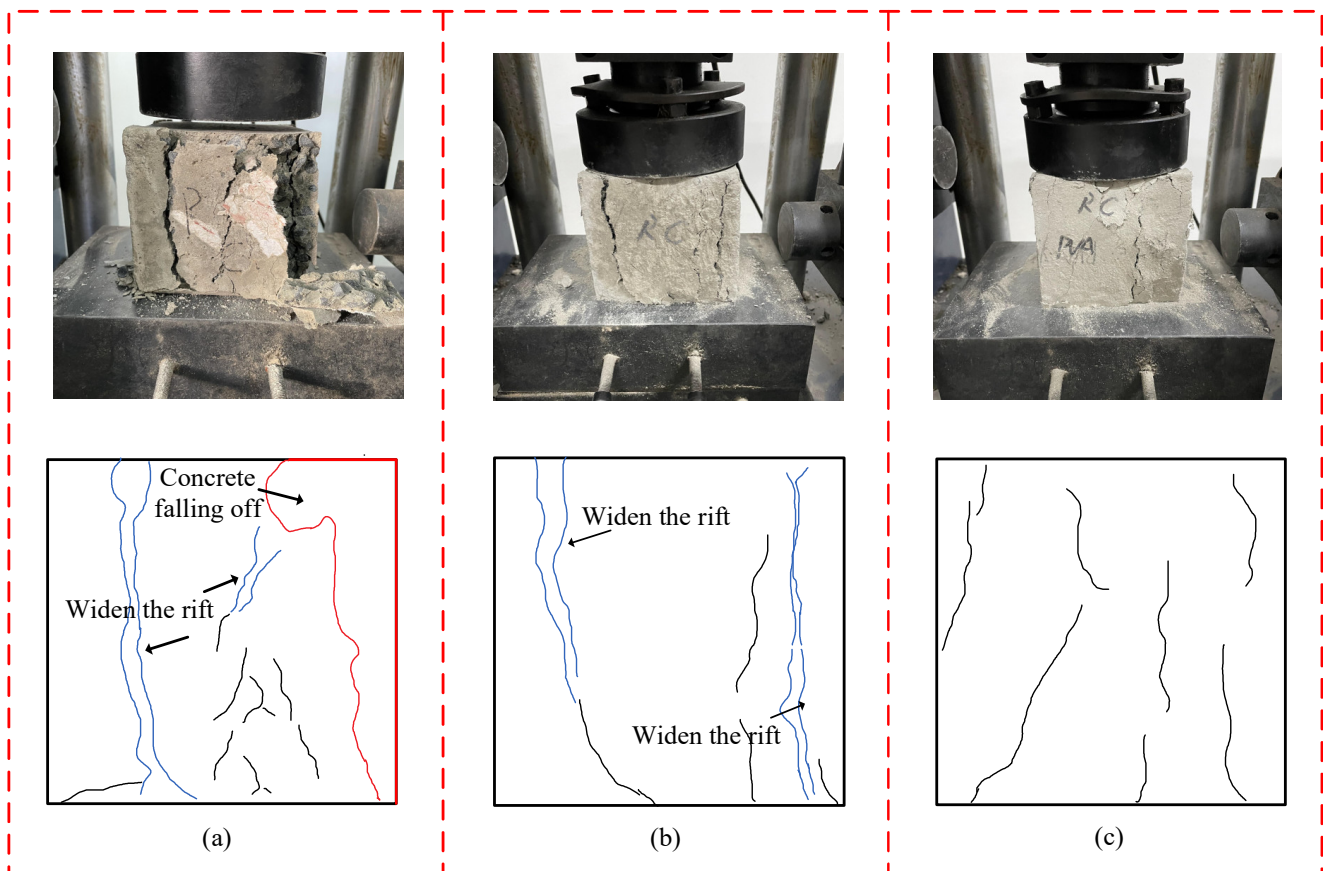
Compressive failure modes of concrete with different compositions: (a) Plain concrete; (b) Rubber concrete; (c) PVA rubber/concrete.
